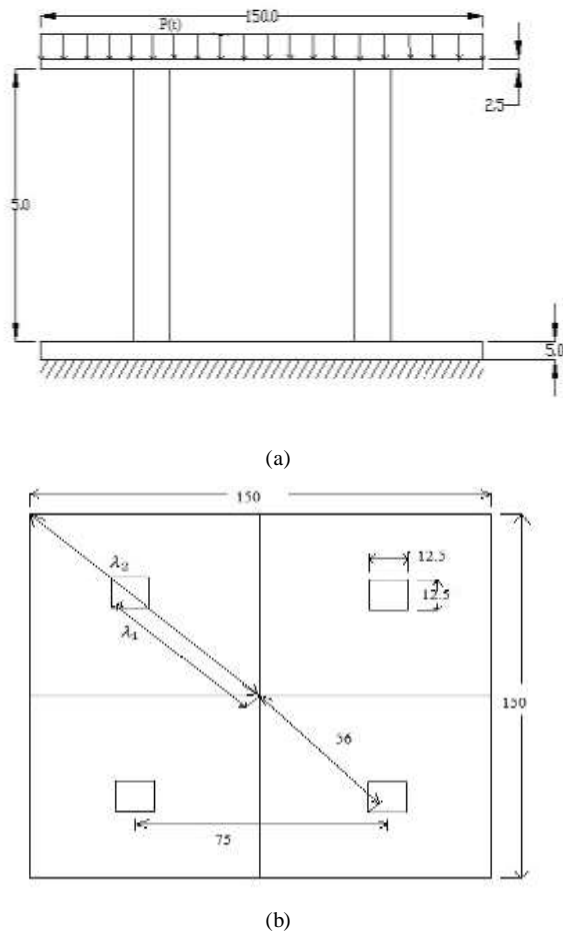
Schematic diagram the sandwich panel (a) Elevation (b) Plan view
